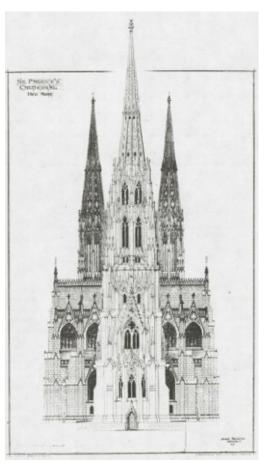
Elevation of east end, St. Patrick's Cathedral showing proposed Lady Chapel.
